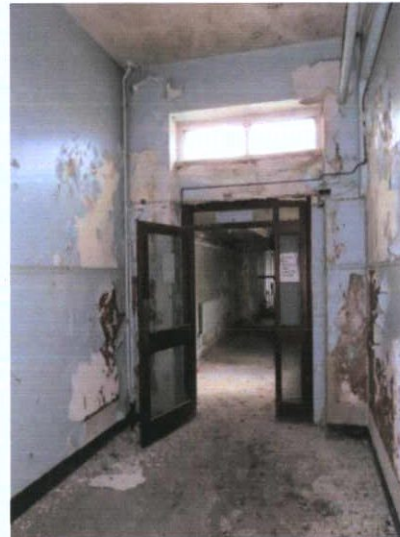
F-6 – View to west "(photo key 66 is in F-5)"
